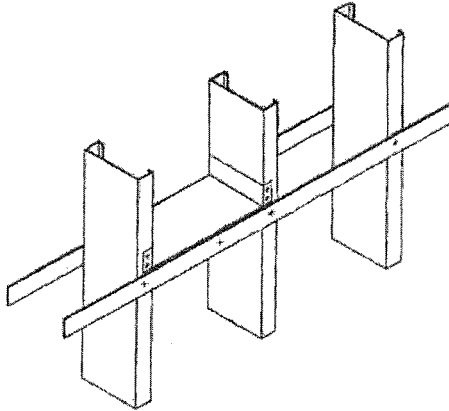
Strap Braces and Shear Block (AISI 2002d)
